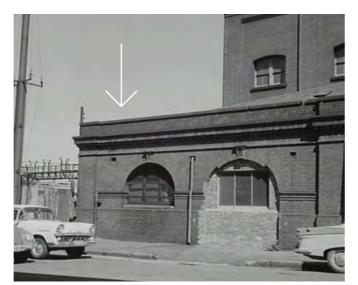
Proposed site for bridge on William Henry Street, 1965 (Source: City of Sydney Archives NSCA CRS 48/4598, CC BY 4.0)
